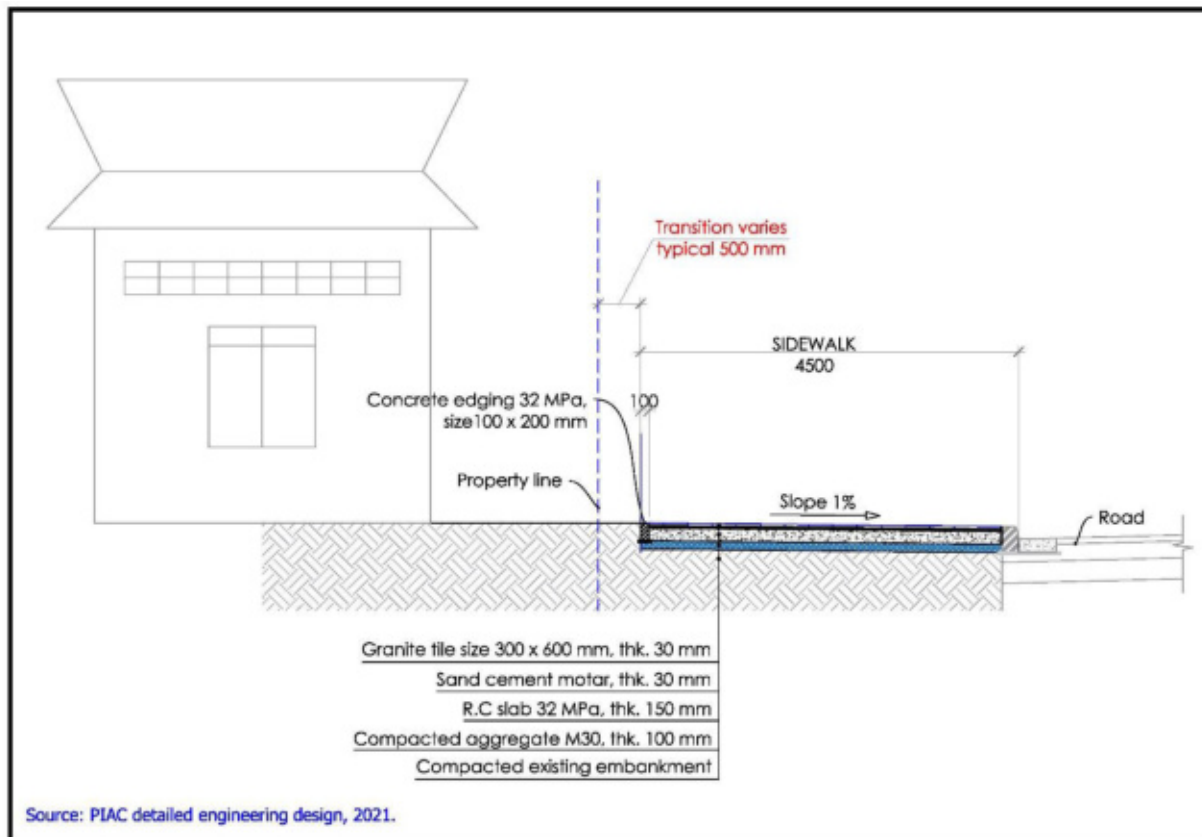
Cross-sections of planned footpath type-1 (trafficable)
